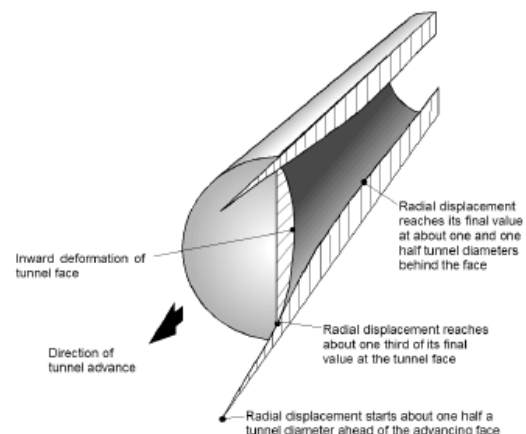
Pattern of deformation in the ground surrounding an advancing unsupported tunnel
